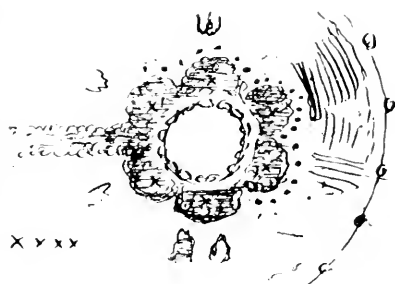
Plan of Central Cavity, showing Soft Wood Piles.
